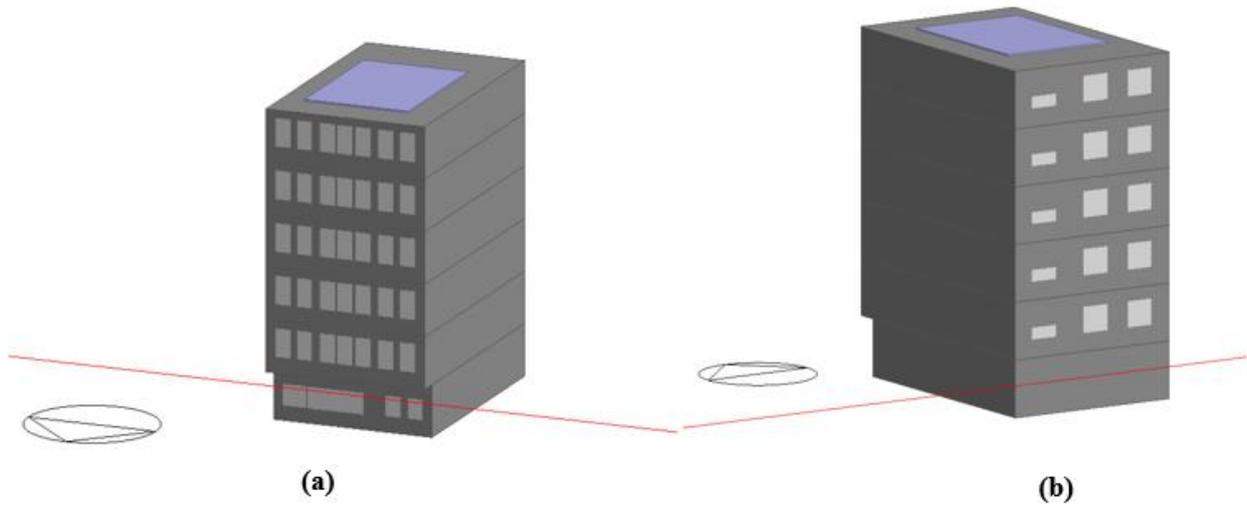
3D building model of case study: a) North view of the building b) South view of the building.
